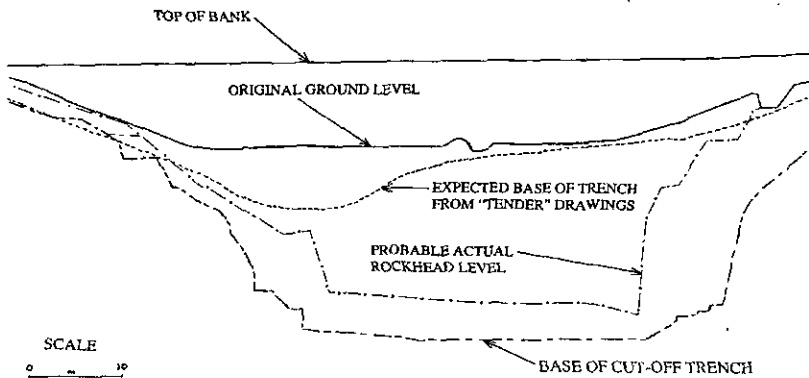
As Constructed Drawing (Adapted from the original of 1870)
